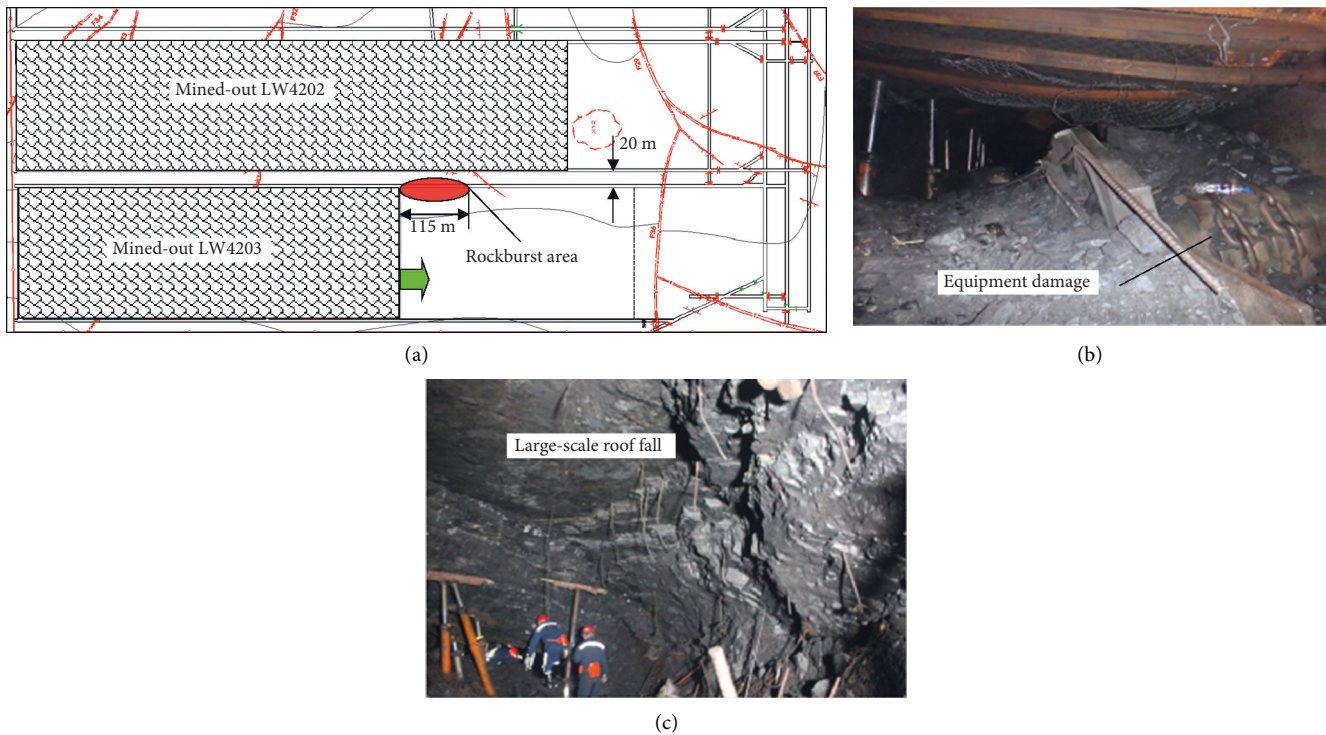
Rockburst photos of gob-side entry in Danshuigou Coal Mine: (a) plane position map of working face; (b) field photo of equipment damage; (c) field photo of roof fall.
